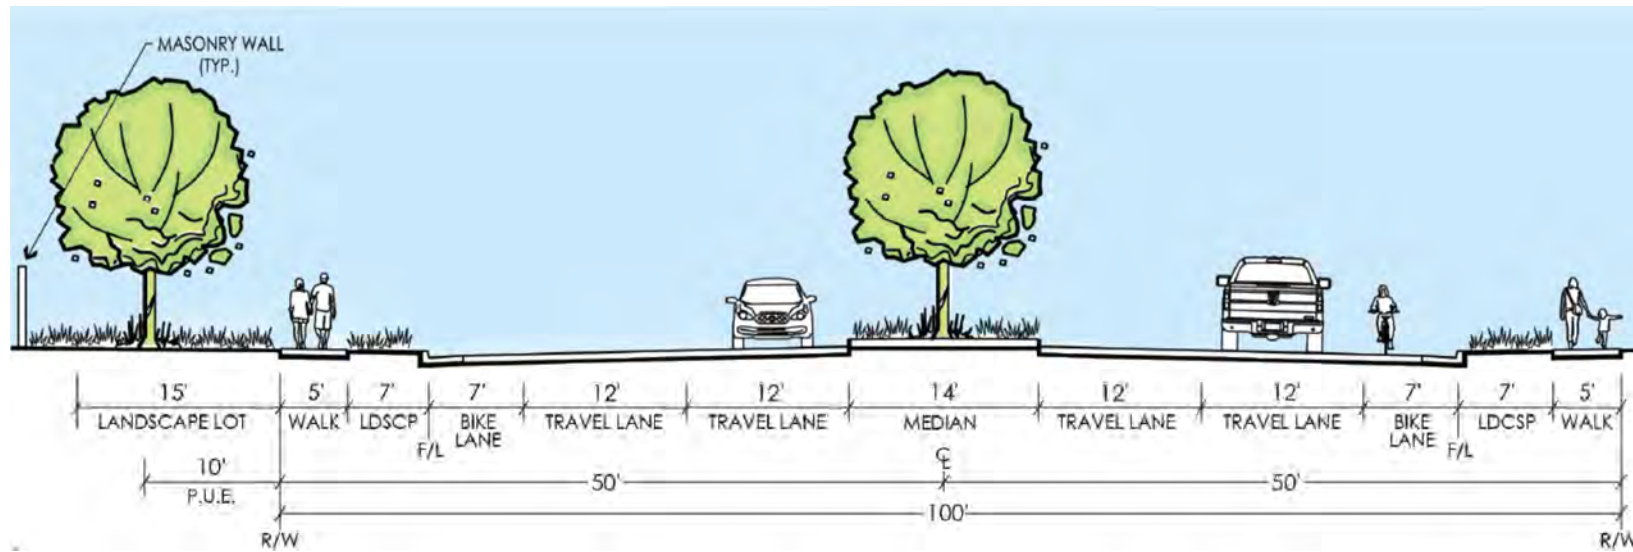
CENTRAL AVENUE & MOFFETT ROAD
